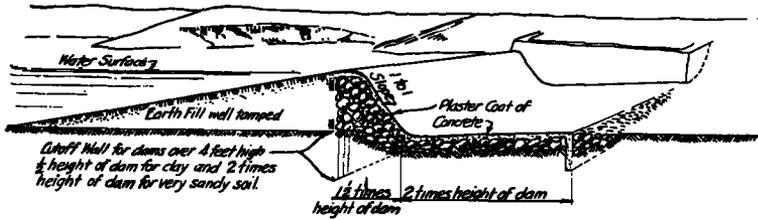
CROSS SECTION OF CONCRETE COVERED
